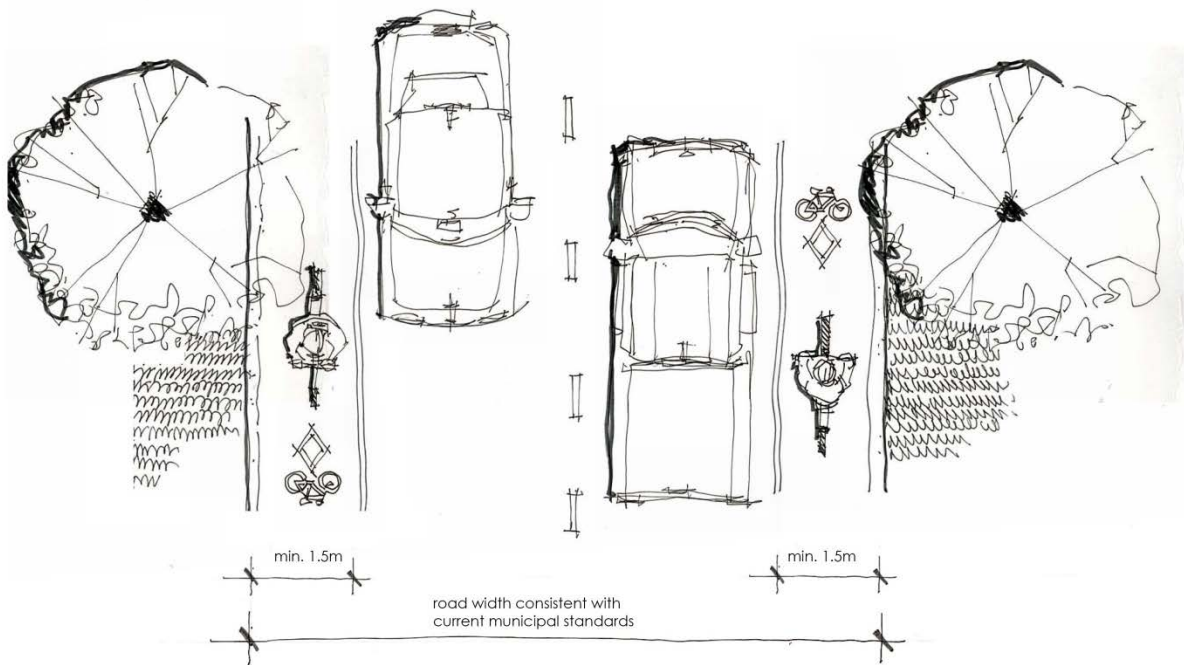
On-Street Trail Corridor (Urban) with Bike Lane Pavement Markings
